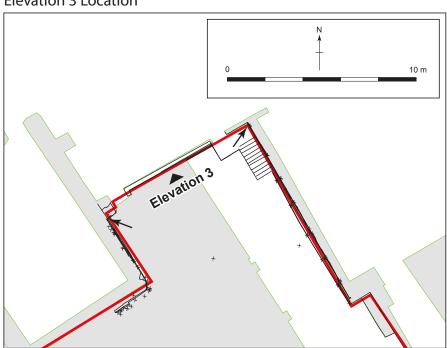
Kalendar Hall, Cathedral School, Exeter: Elevation 3
